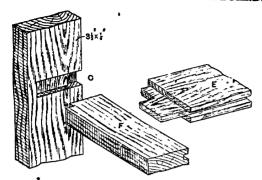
Stile, Front Rail, and Runner of Cupboard Fitment.
